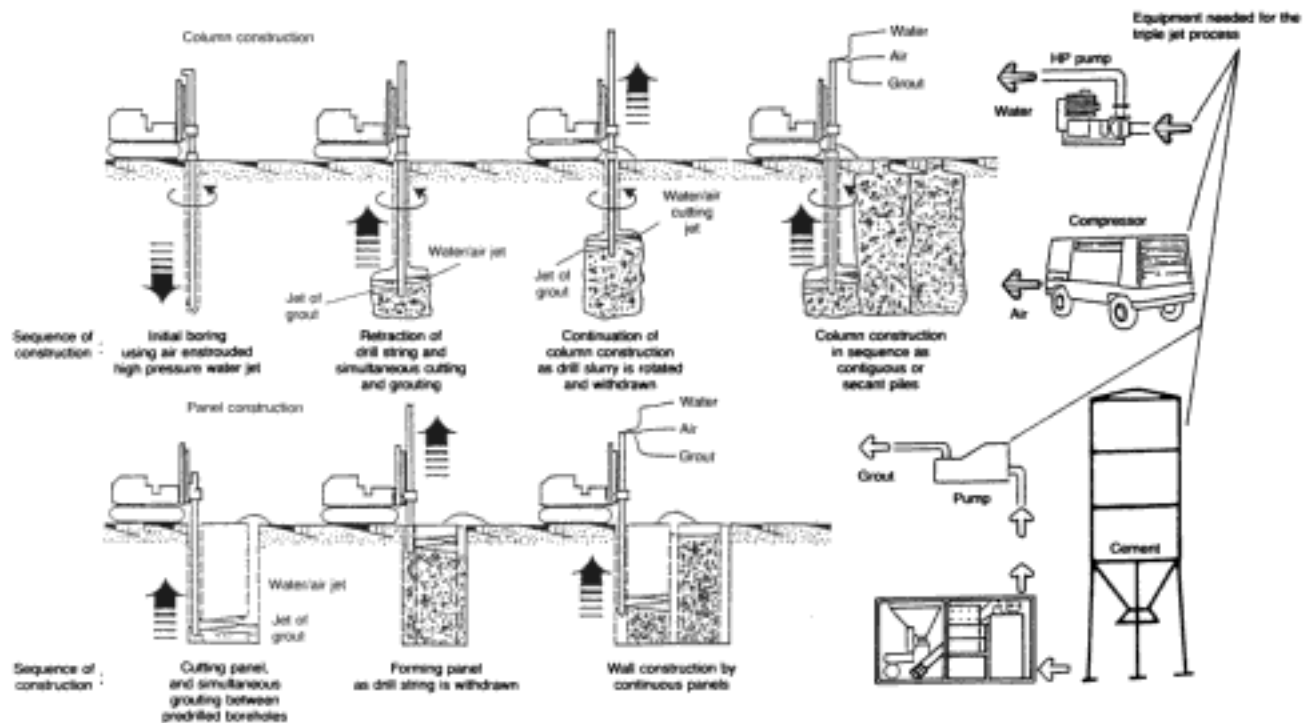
Jet grouting: column and panel construction by the triple-jet process (courtesy of Bachy)
